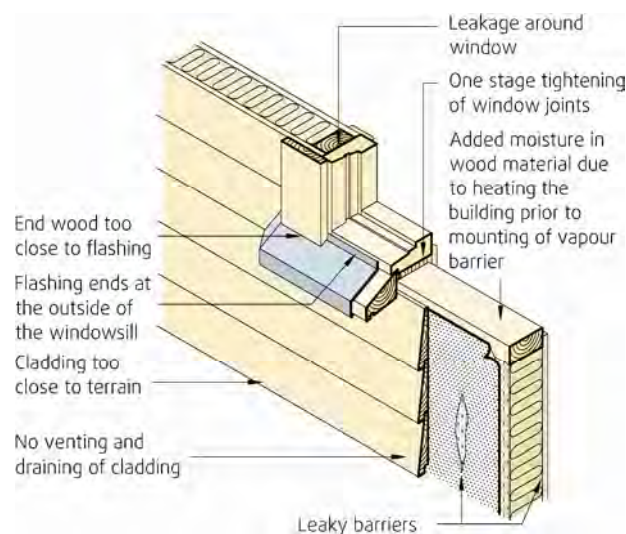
Defects causing damage to wooden cladding (Lisø and Kvande 2007).
